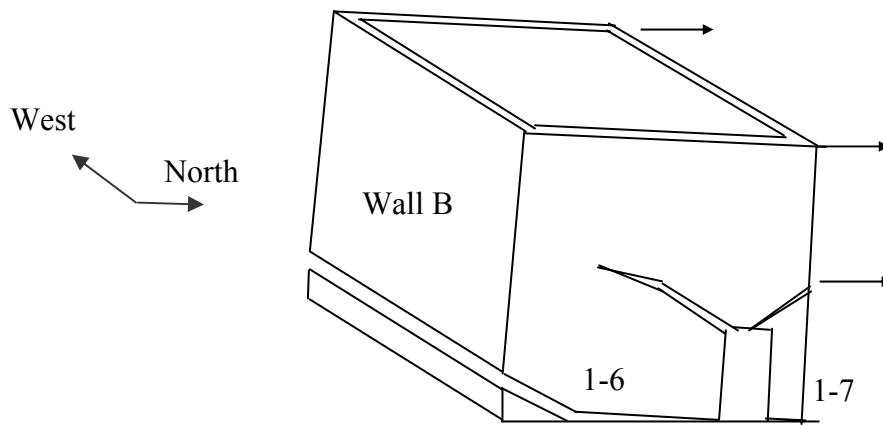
Rocking of Wall 1 as two piers when the wall was loaded in the pull direction
